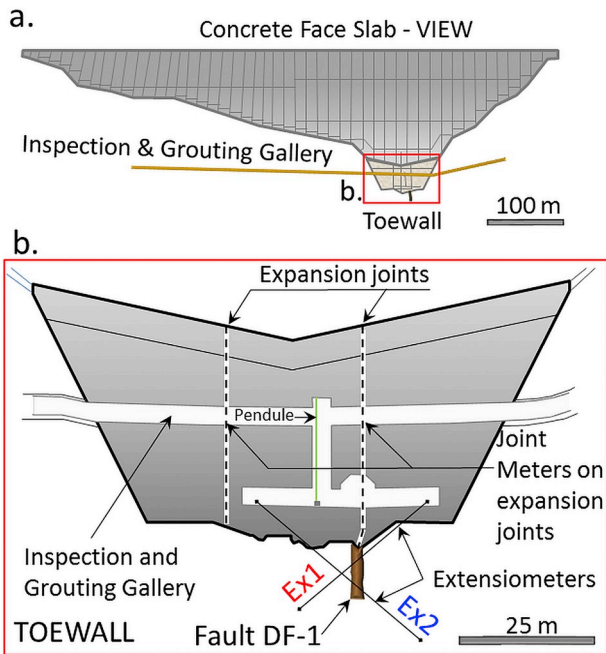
Extension meters crossing the Toe-wall Fault, DF-1, in the foundation of the Kárahnjúkar Dam (K Dam) where the dam is highest (in the canyon). (a) Longitudinal view of the K Dam upstream face. (b) Instrumentation in the Toewall. (Dam instrumentation specified by the designer, Kárahnjúkar Engineering Joint Venture).
